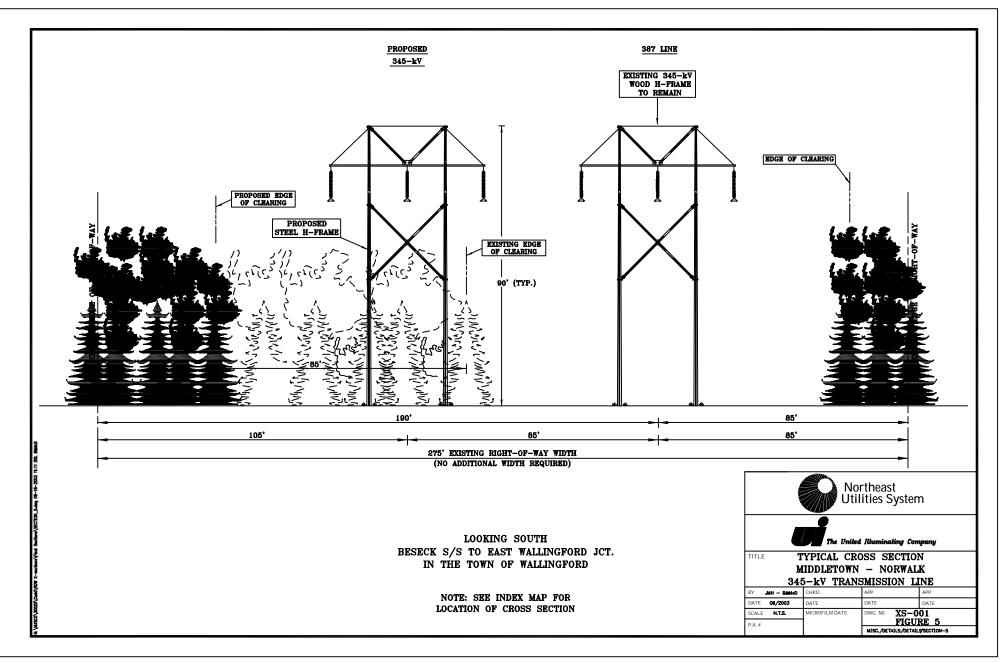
Cross section 5 - Beseck Substation to East Wallingford Junction (Wallingford)
